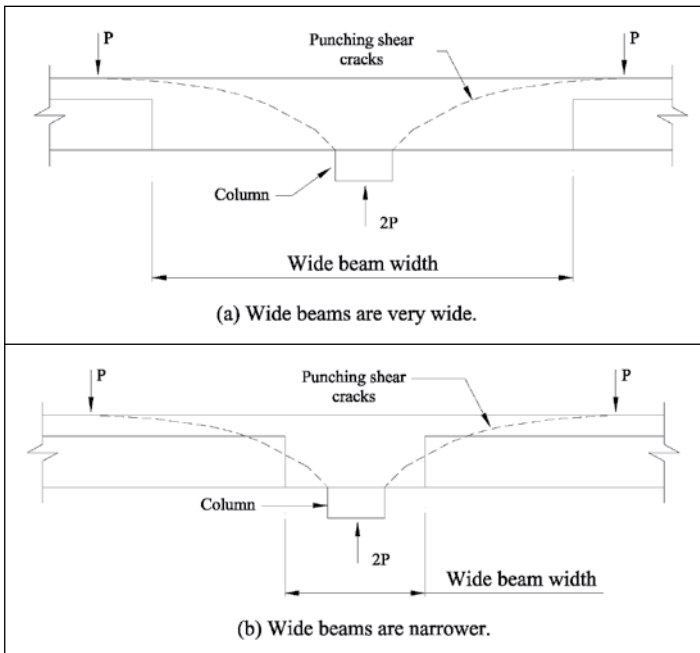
Punching shear failure mechanism of wide beam ribbed slab.
